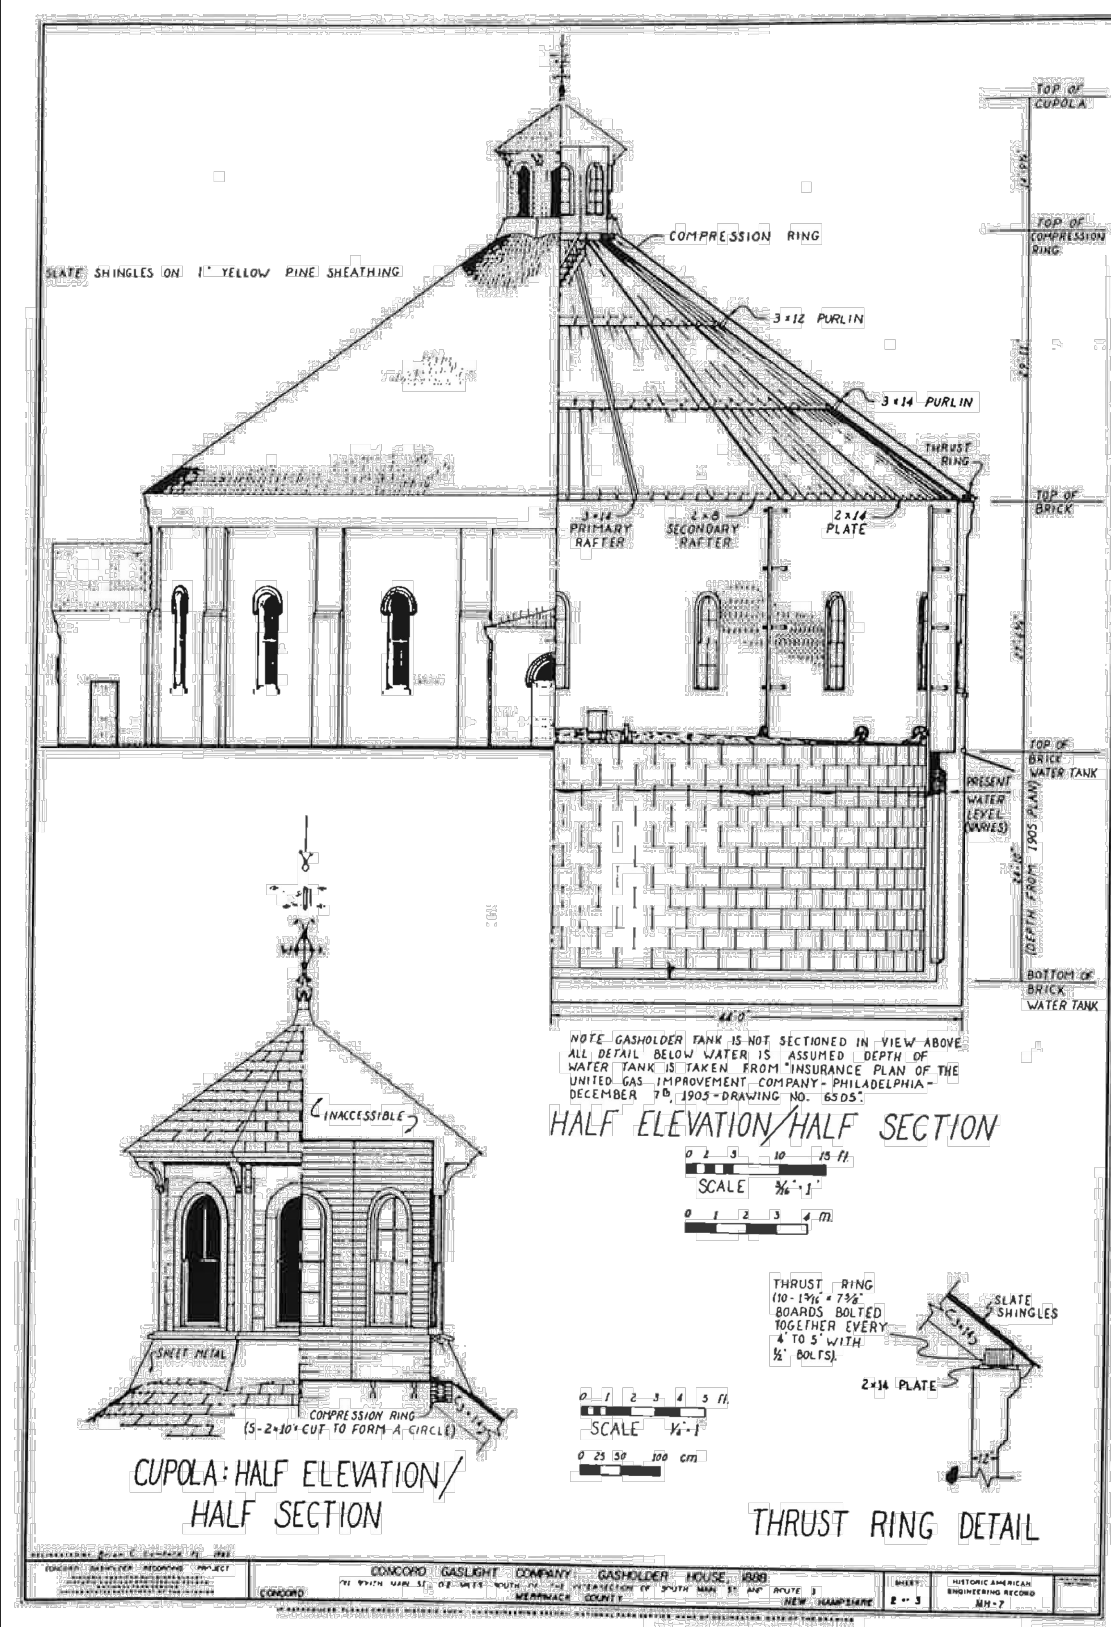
Elevation and section drawings of 1888 gasholder house. HAER, drawing by Brian Lombard, 1982.
